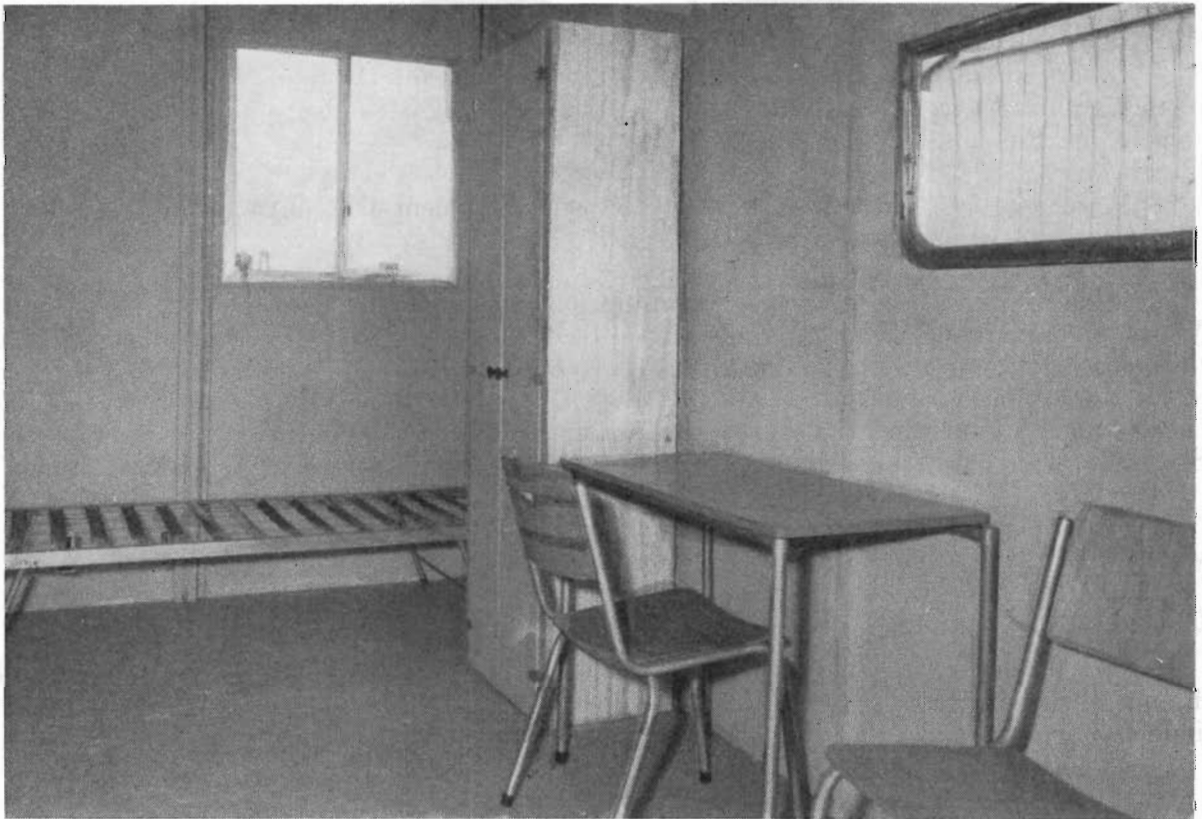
Interior of Board's two-man hut used on construction jobs.
